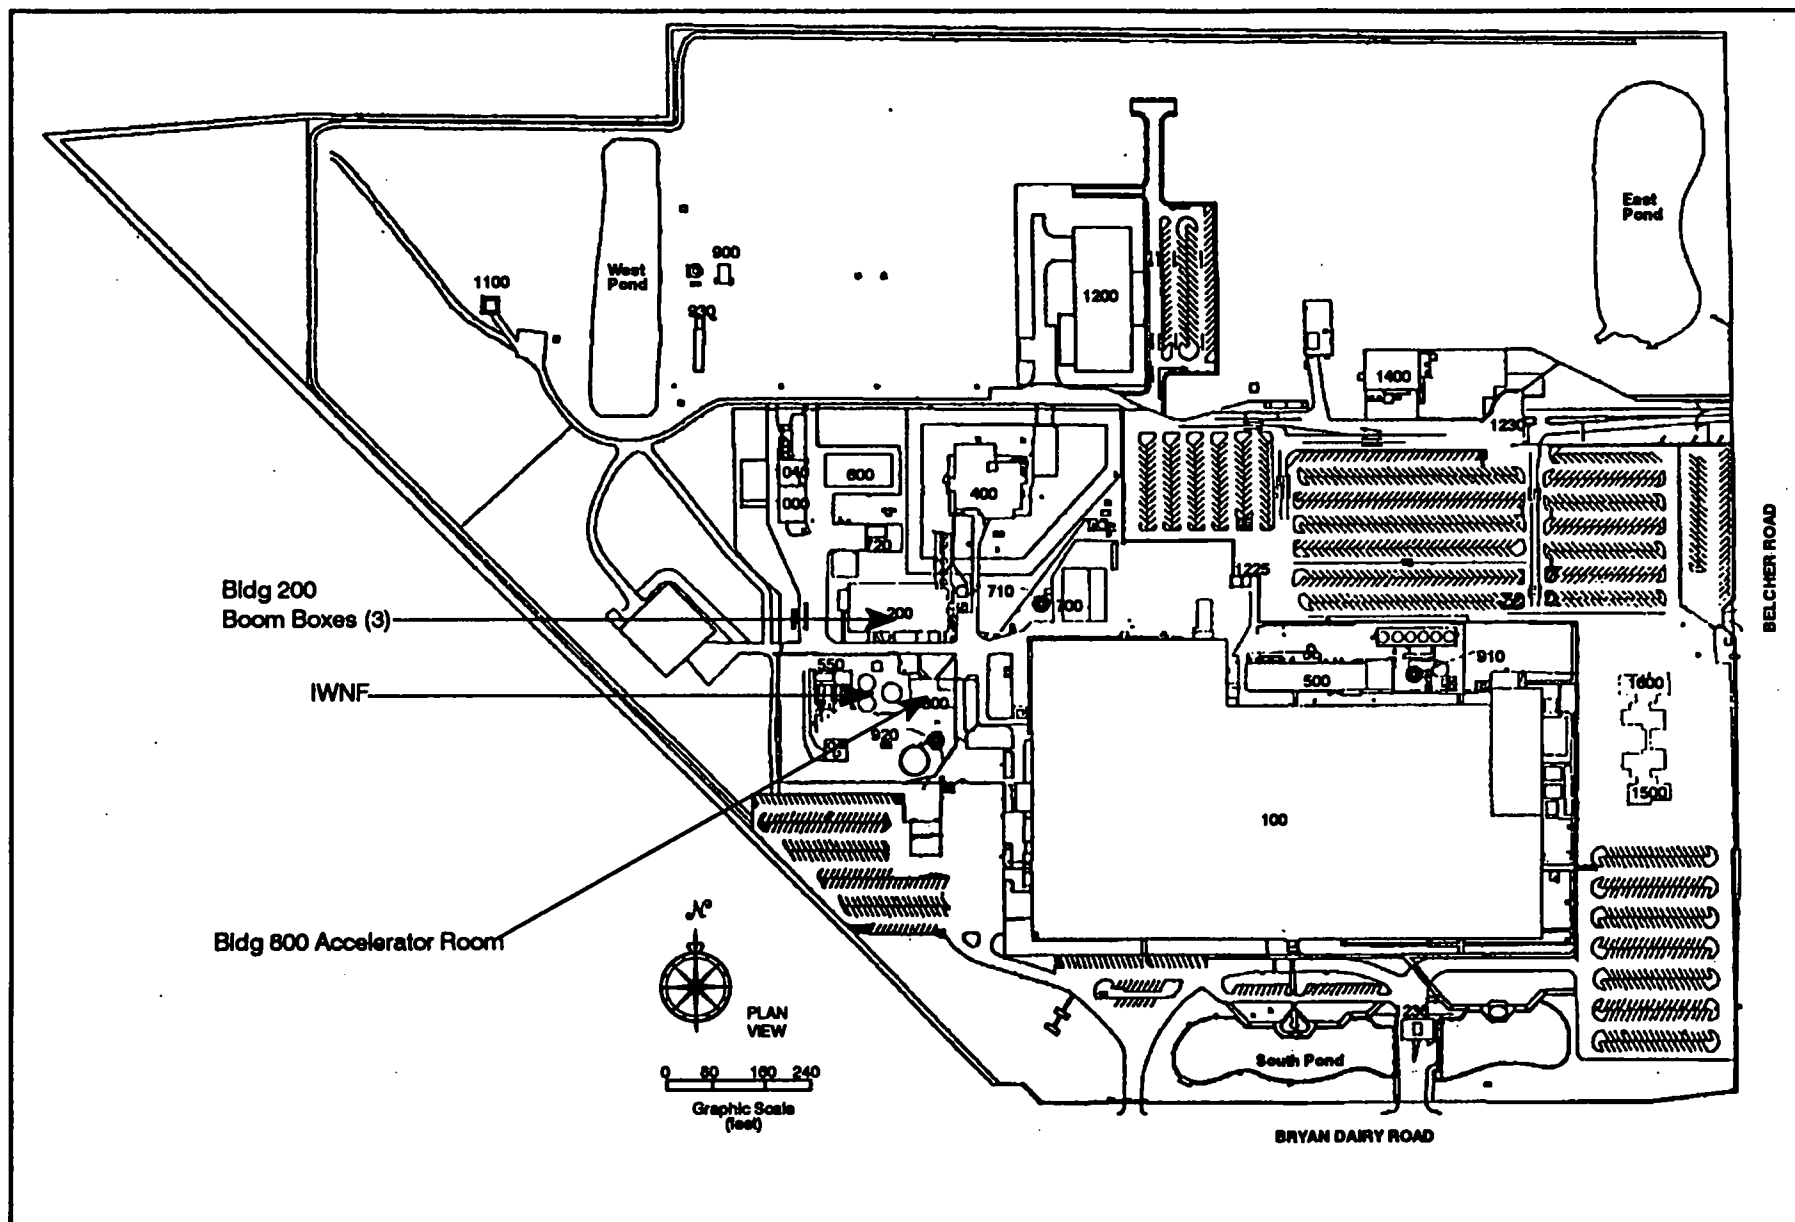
Pinellas Plant RMMAs - Site As-Built
